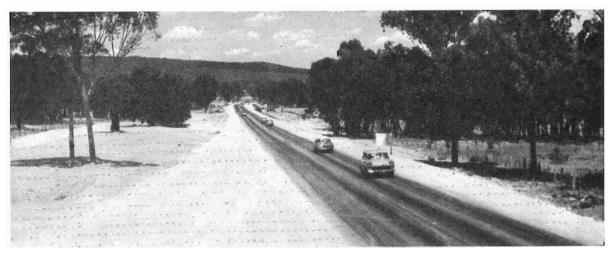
Plate I.—Hume By-pass Road. Traffic using the new section near Chiltern. Chiltern Shire.
